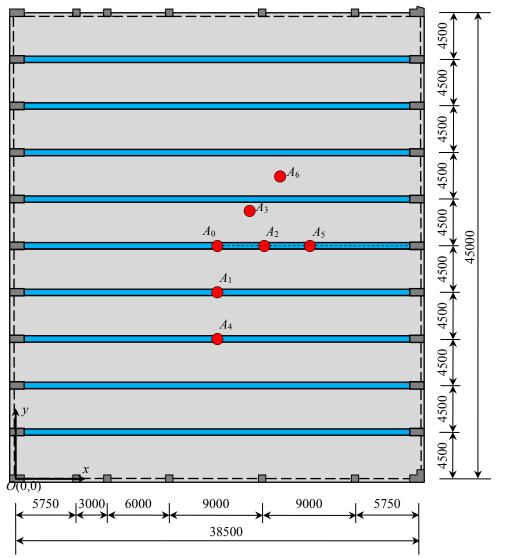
Outline of prestressed concrete floor #5 (all dimensions in mm)
